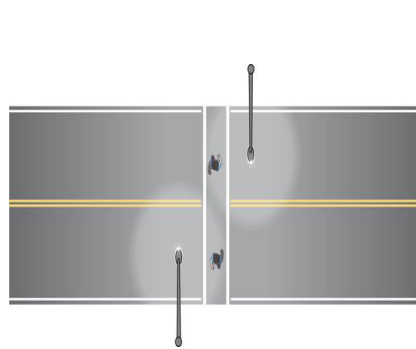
New FHWA design recommendations for lighting layout for crosswalks, Source: FHWA Report on Lighting Design for Crosswalks, April 2008.
